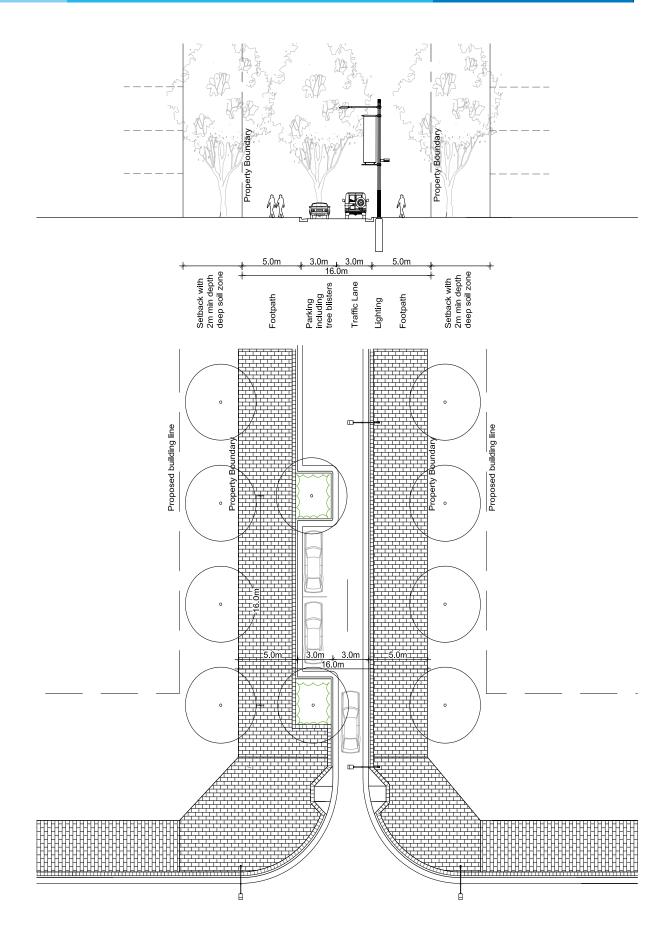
Typical Layout - New 16-metre wide Streets (NOT TO SCALE)
